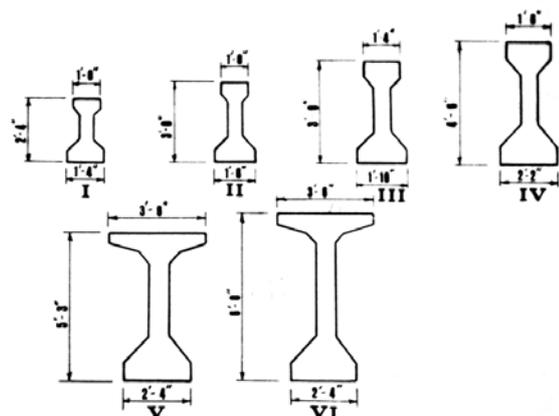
Standard precast prestressed I-section, AASHTO (Podolny and Muller)
